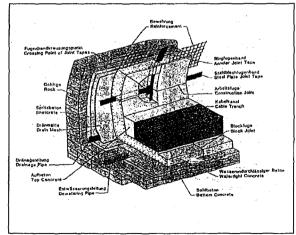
Construction Details of Lining and Drainage for Markstein Tunnel – Germany
